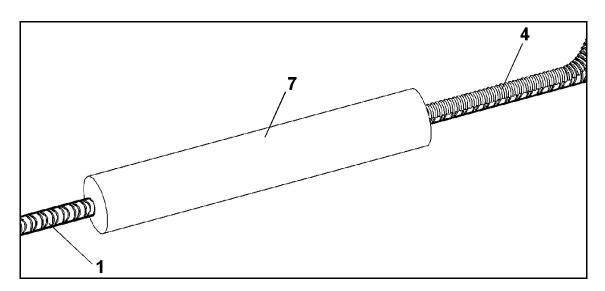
The final look of the strain sensor after application of protection coatings and physical protection of measurement area made of cement mortar: 1 - reinforcement bar; 4 - PE tube for cable protection; 7 – cylindrical shaped protection of measurement area made of cement mortar with the addition of acrylic emulsion (diameter 50mm)
